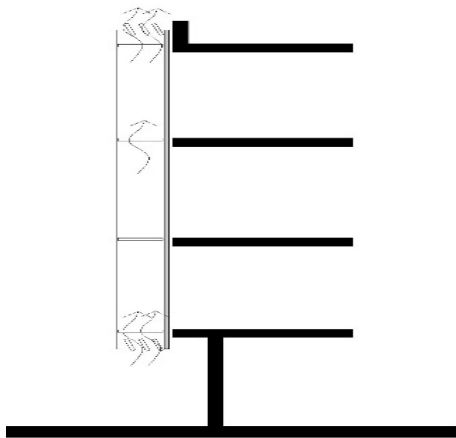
Cross-section of a double skin wall showing ventilation vents at the bottom and top (drawing by author)
